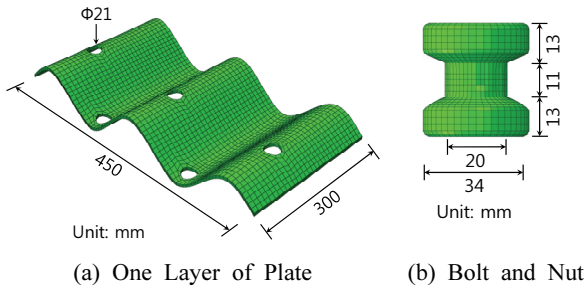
Finite Element Modeling of Corrugated Steel Plate Structure
